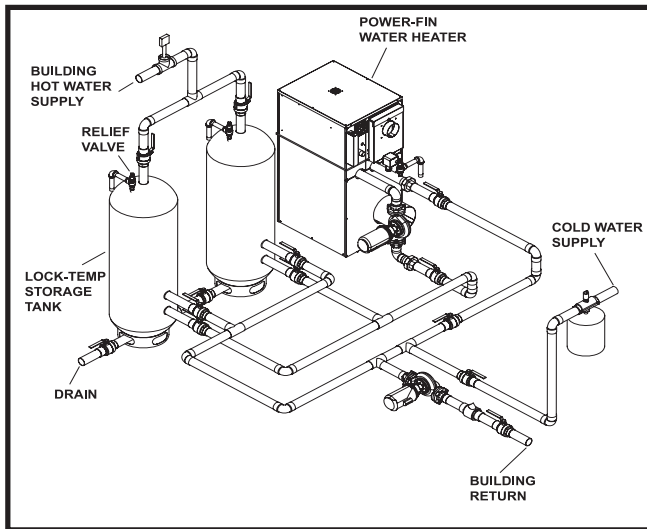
Single Water Heater Piping with Two Storage Tanks
